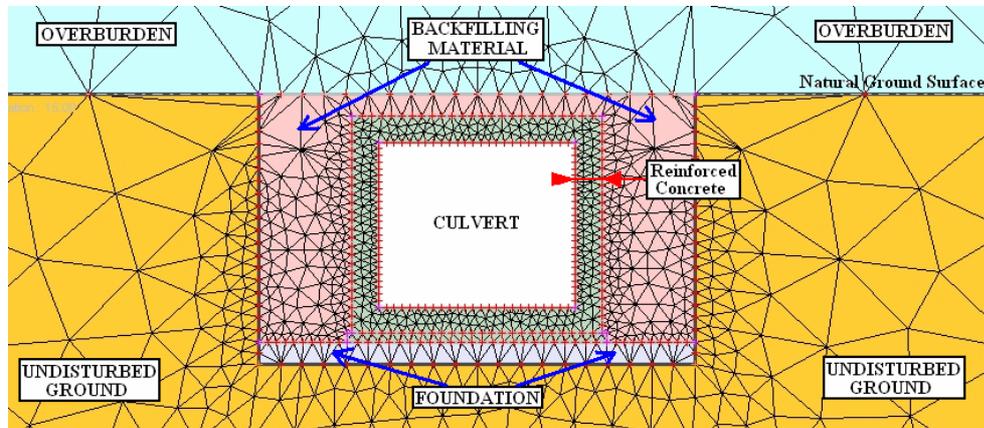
Large cross-section box-shape culvert model for negative projecting embankment condition
